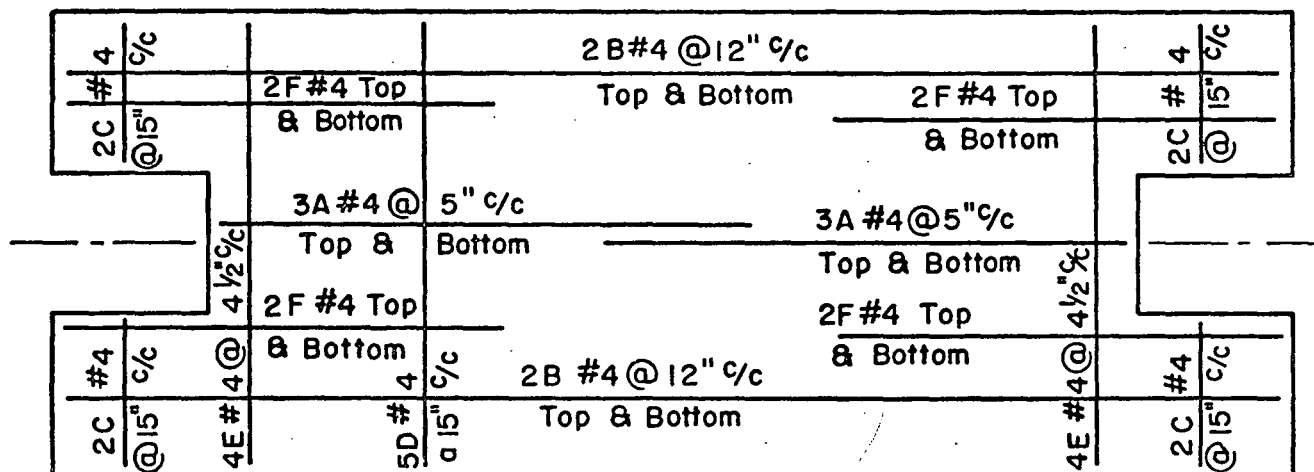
REINFORCEMENT DETAILS FOR BEAMS A, B, C, D, G & H
